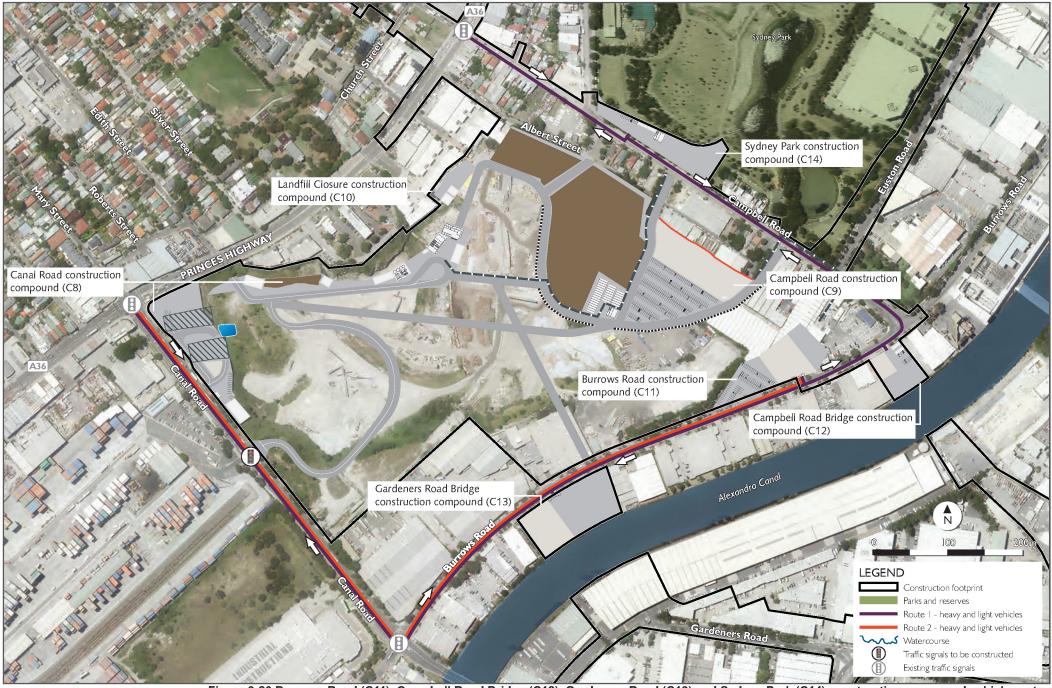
Burrows Road (C11), Campbell Road Bridge (C12), Gardeners Road (C13) and Sydney Park (C14) construction compound vehicle routes
